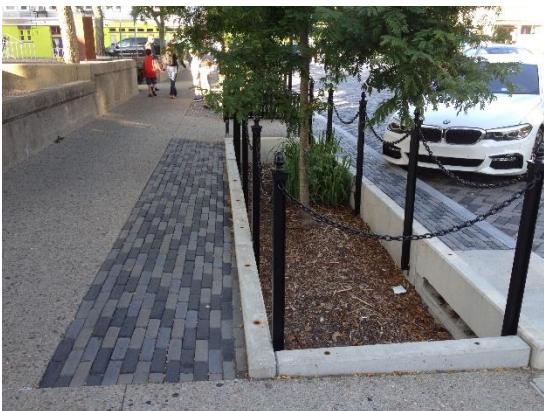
Stormwater planters in Newport, Rhode Island are integral to the design of the sidewalk including being set off with decorative paving. Stormwater planters can help ensure tree health while infiltrating and cleaning stormwater (Dodson & Flinker)
